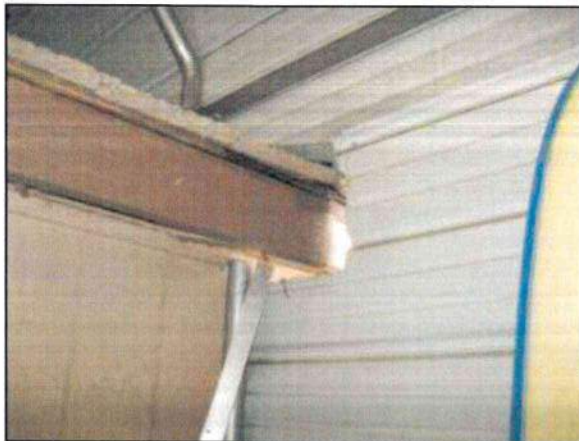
Fire Station #4 A general view of the inside of the main building where the steel addition adjoins with it, showing the significant gap between the two structures.
